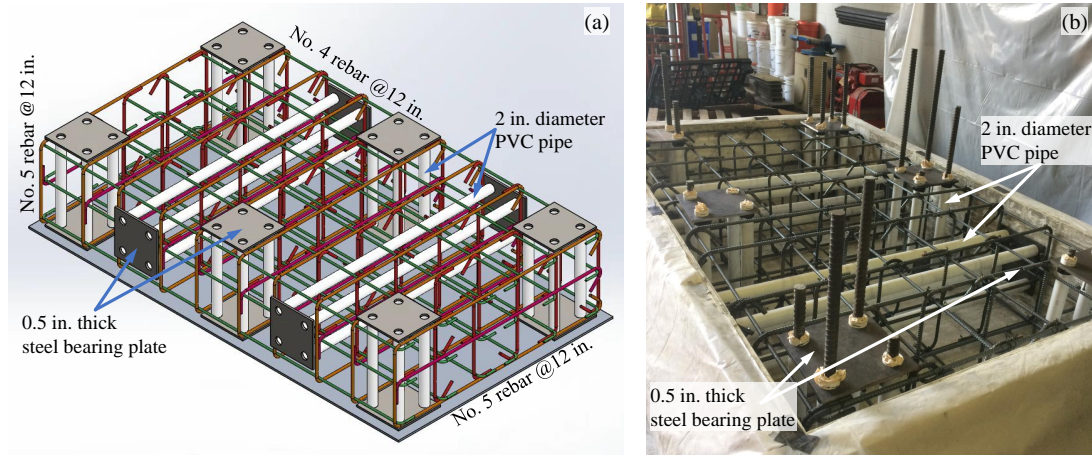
Modular concrete reaction block: (a) isometric view of design drawing (b) block during construction before pouring concrete.
